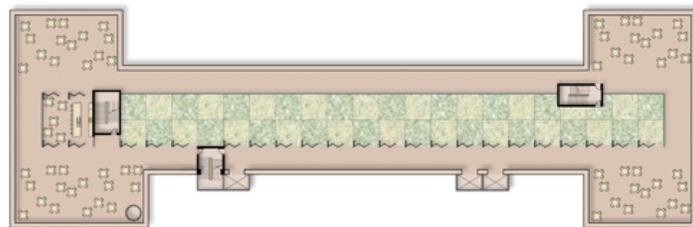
Proposed Rooftop Level of the Michigan Central Station
